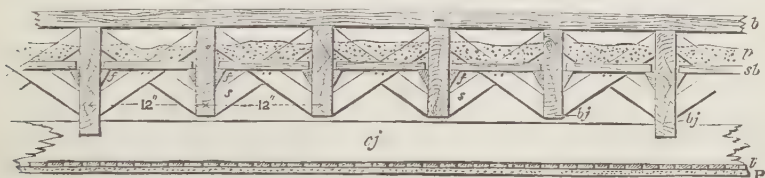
Section of Single Floor, showing Pugging, Sound-Boarding, and Herring-bone Struts.
